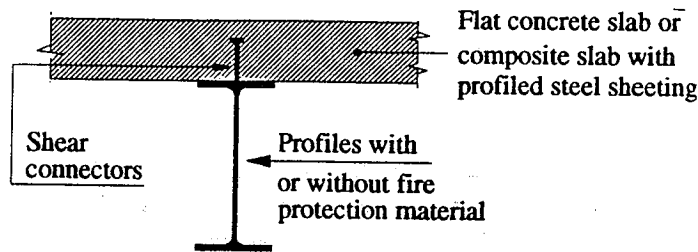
Composite beam comprising steel beam with no concrete encasement
